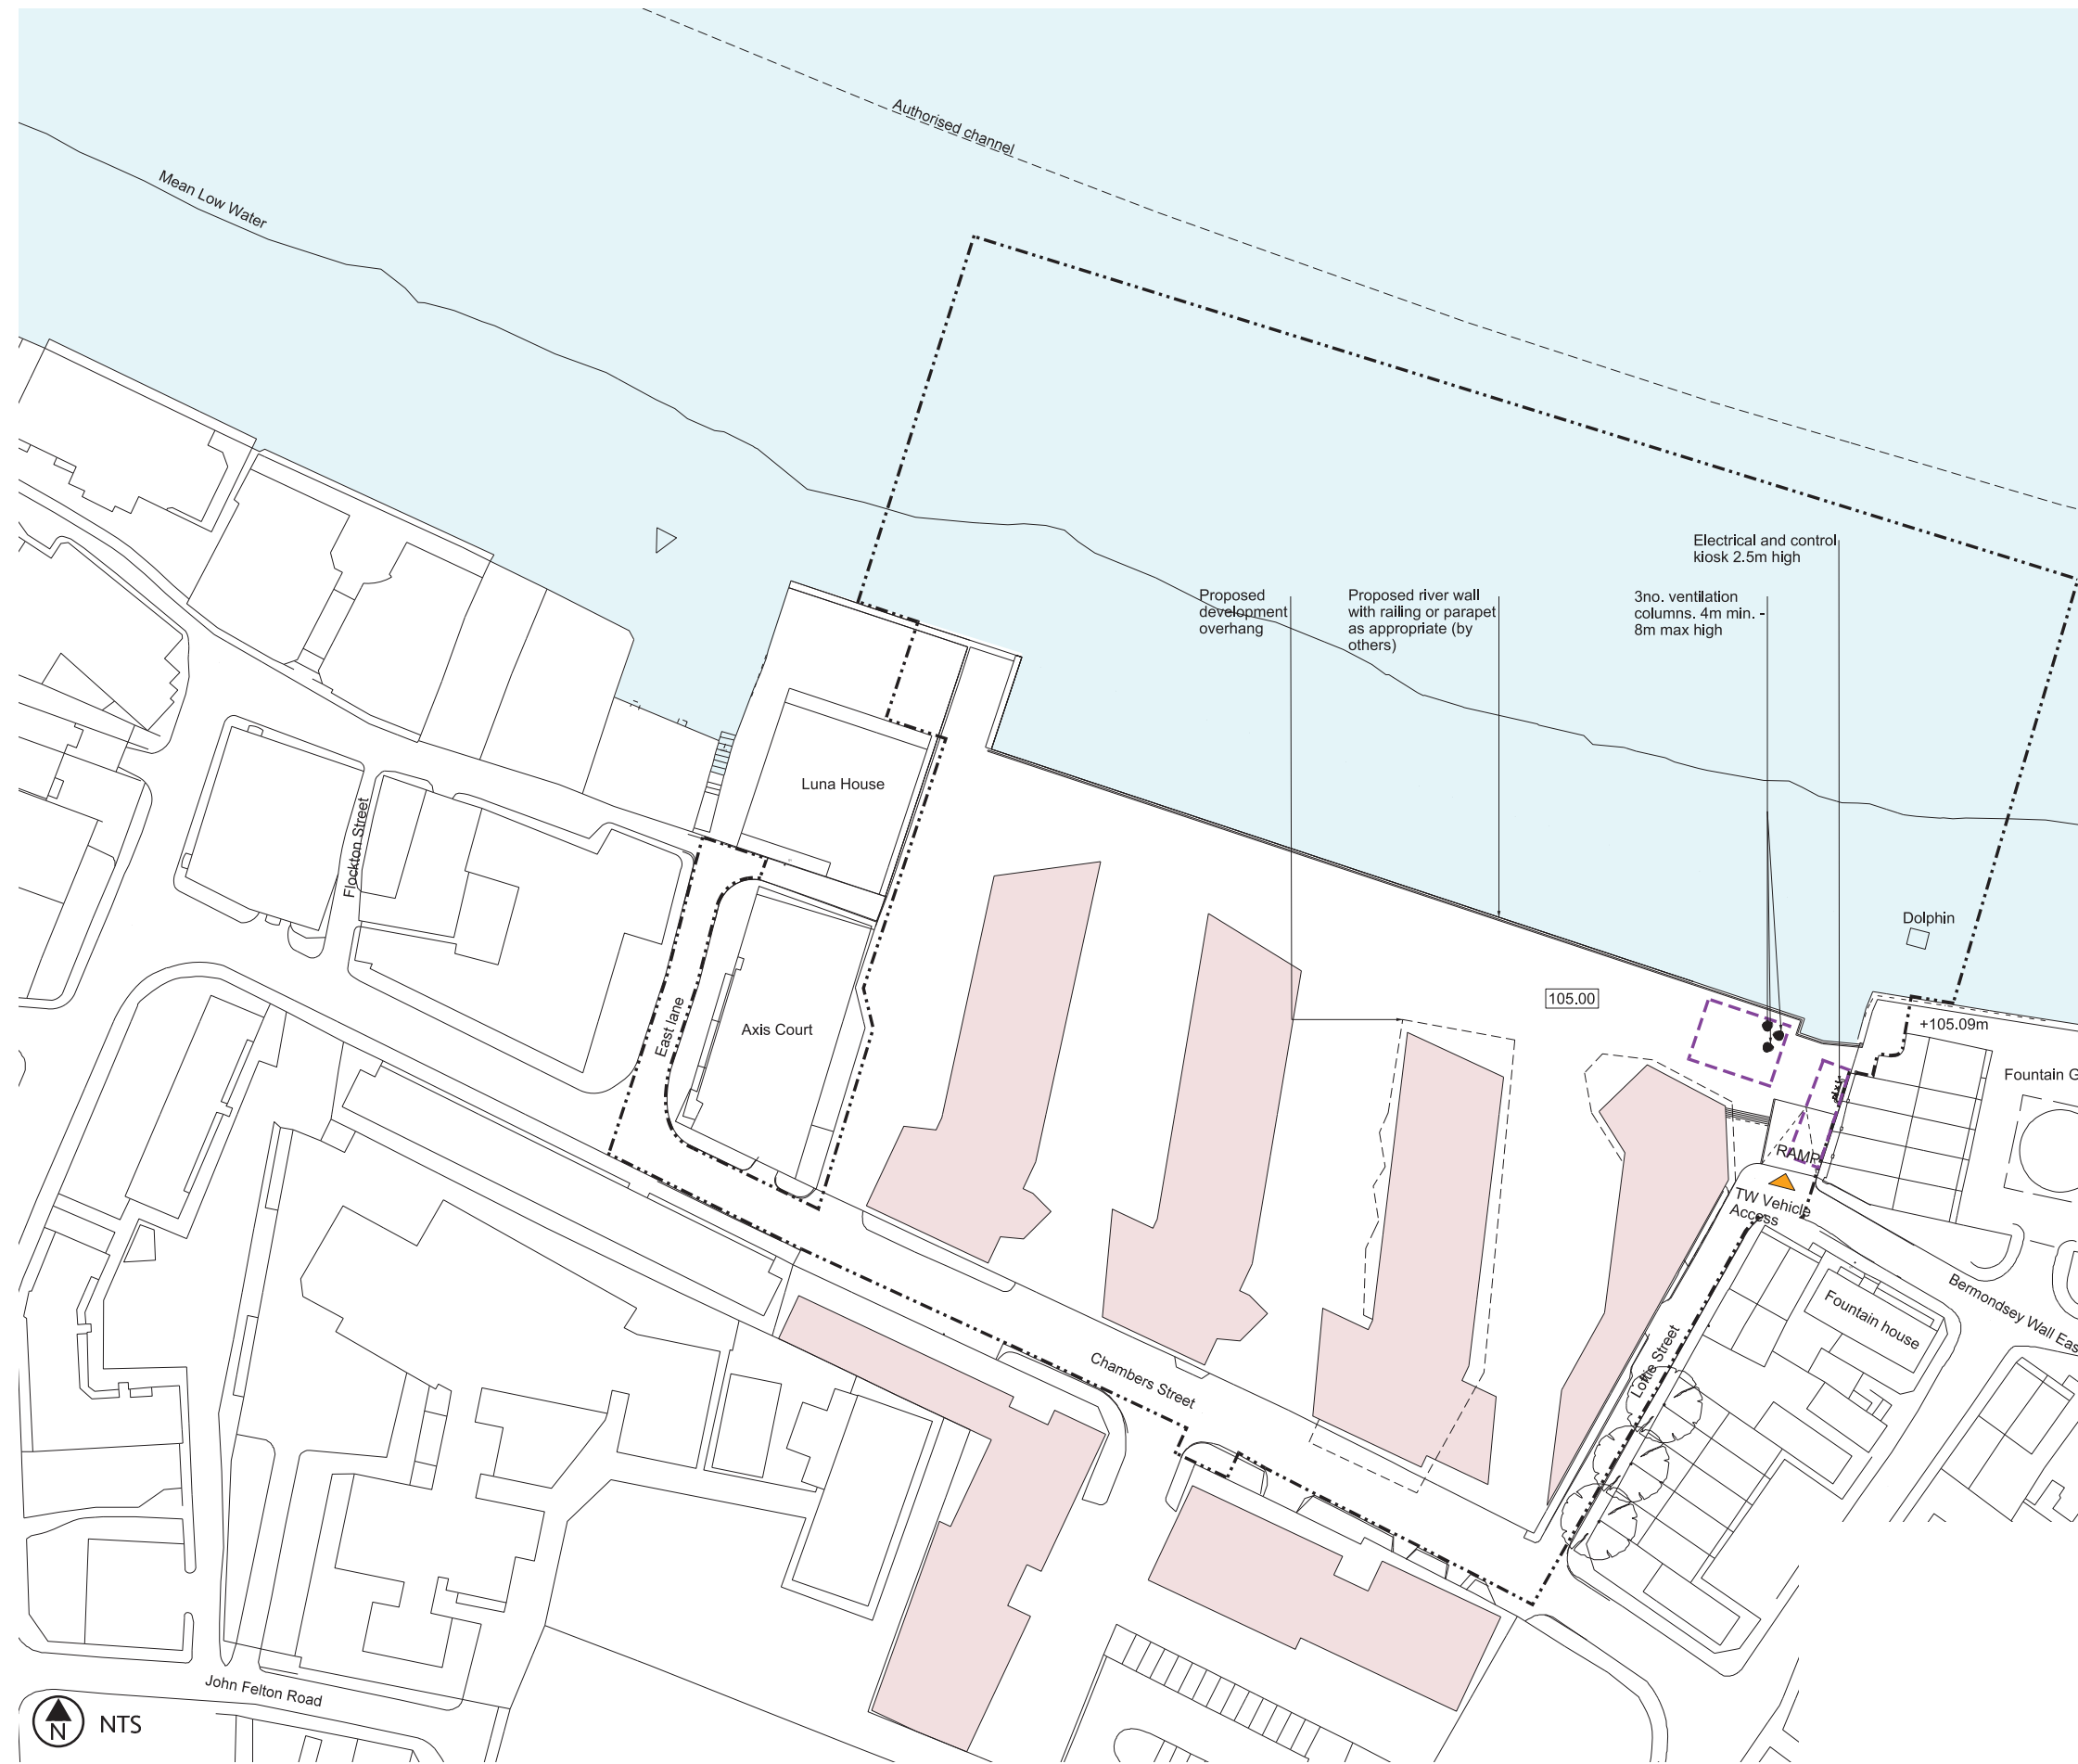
Proposed site features plan - refer to Proposed site features plan - overall in the Book of Plans
